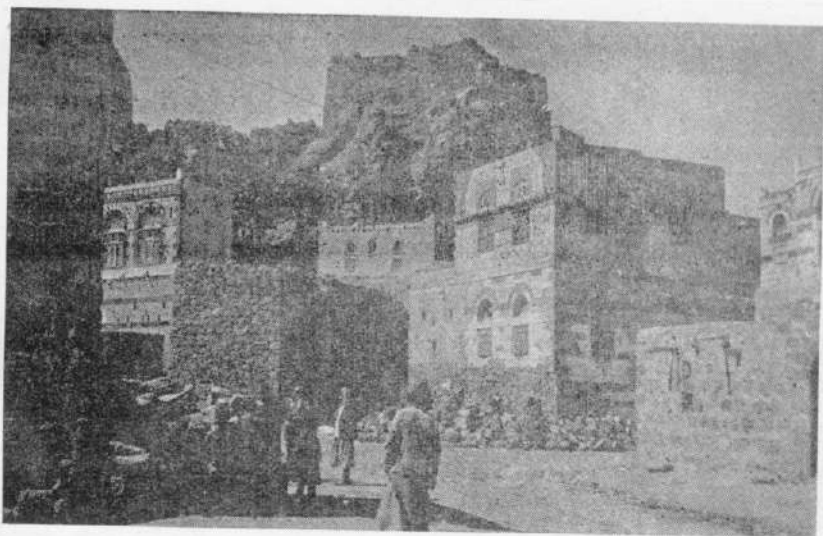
Collapse of upper floor of a house on hill top. Other houses cracked but not collapsed in village Warakah. Separation of walls seen at their intersections.
